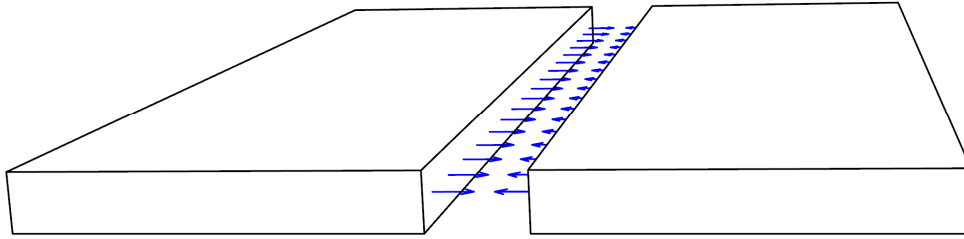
Normal forces between floor elements that occurs when the main load provider is lost.
